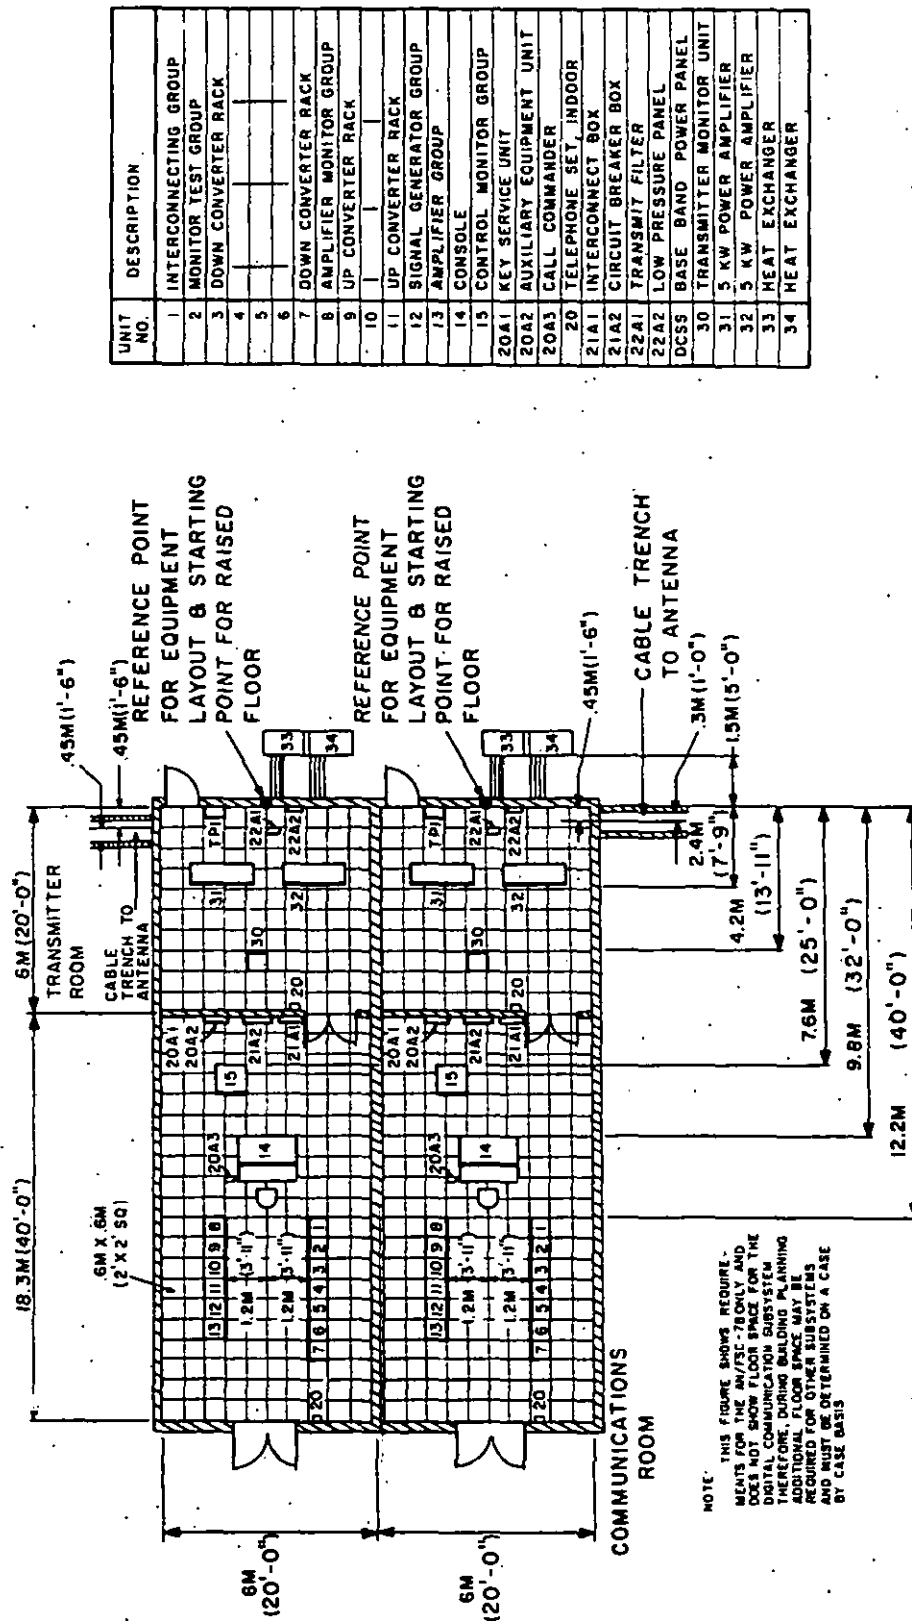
Technical equipment building floorplan, dual configuration, AN/FSC-78.
